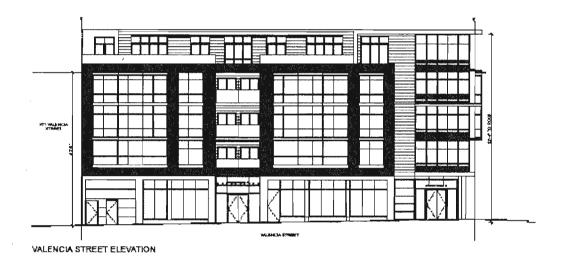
Elevation, Front (Facing South and West) 899 Valencia Street
